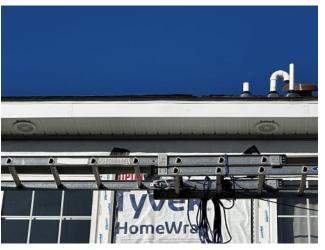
Overview of new bathroom vent caps installed at the intake soffit.
